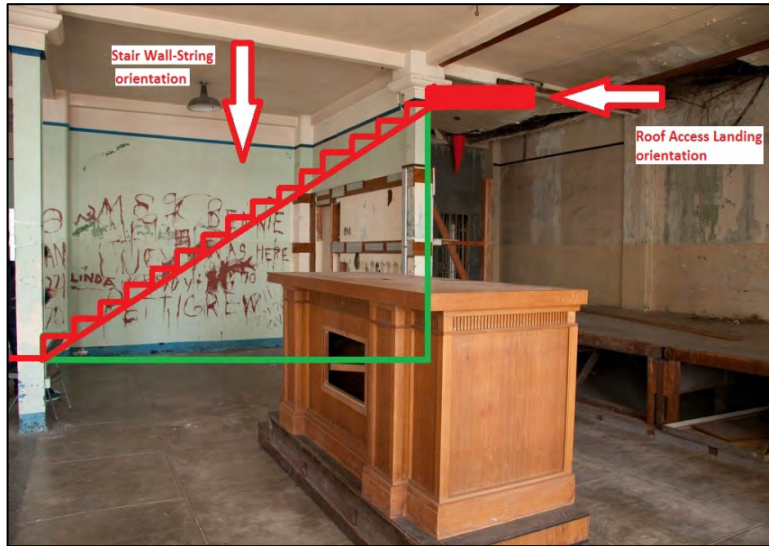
Diagram showing the locaiton of the stair and landing behind the wall.
